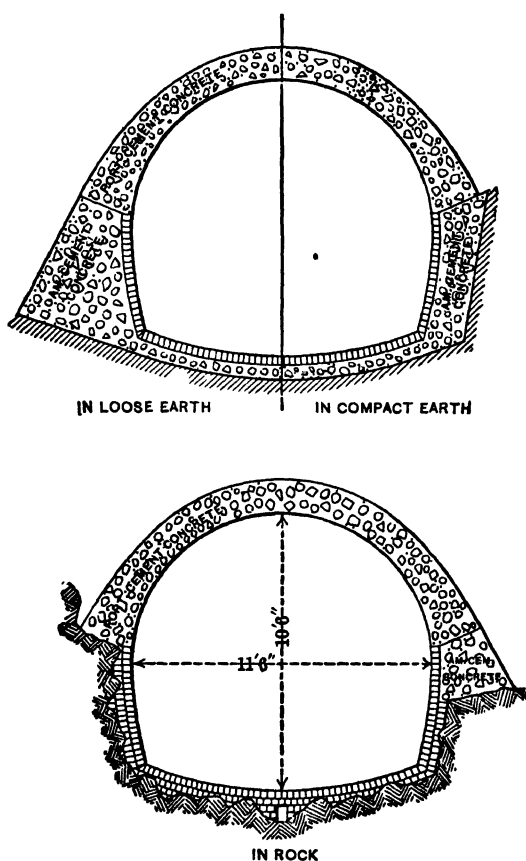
Sections of Nashua Concrete Aqueduct, Metropolitan Water Supply.
